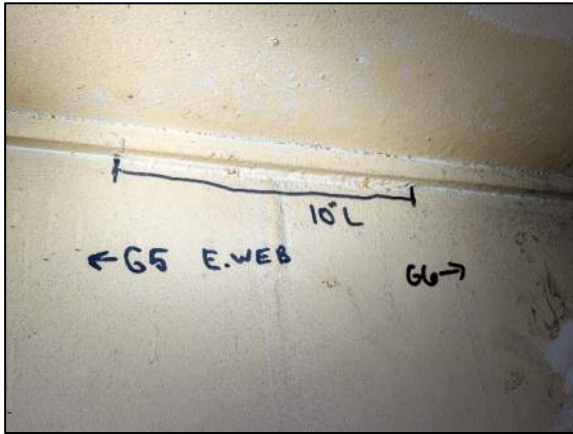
Fillet weld intersecting web butt weld on the top flange between Girders 5 and 6
